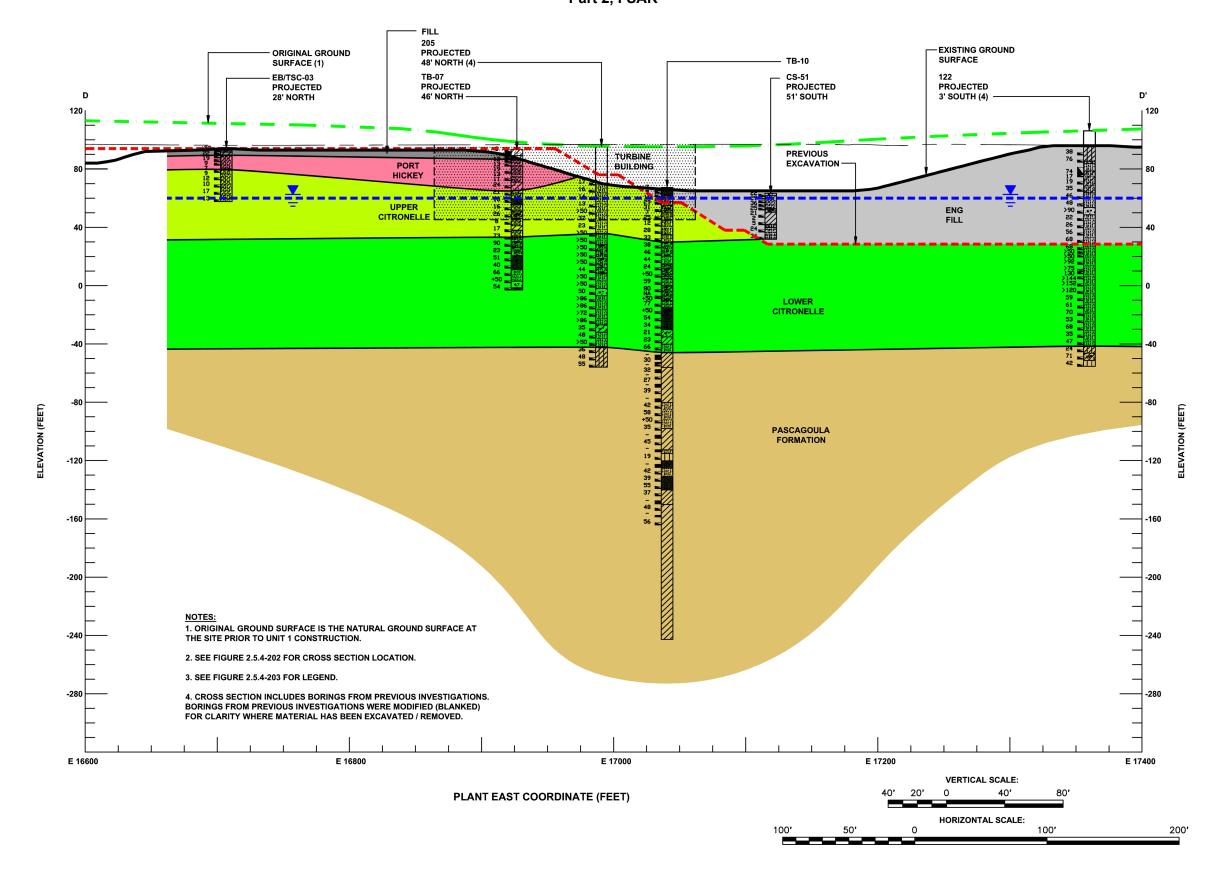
Cross Section D-D' Through RBS Unit 3 Site Location
